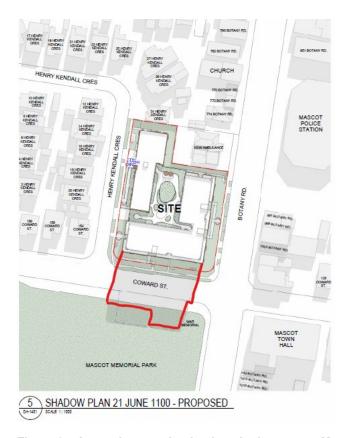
Approximate reduction in solar impacts to Memorial Park shown in red, if the Coward Street elevation is amended to be part 6, part 8 storeys.
